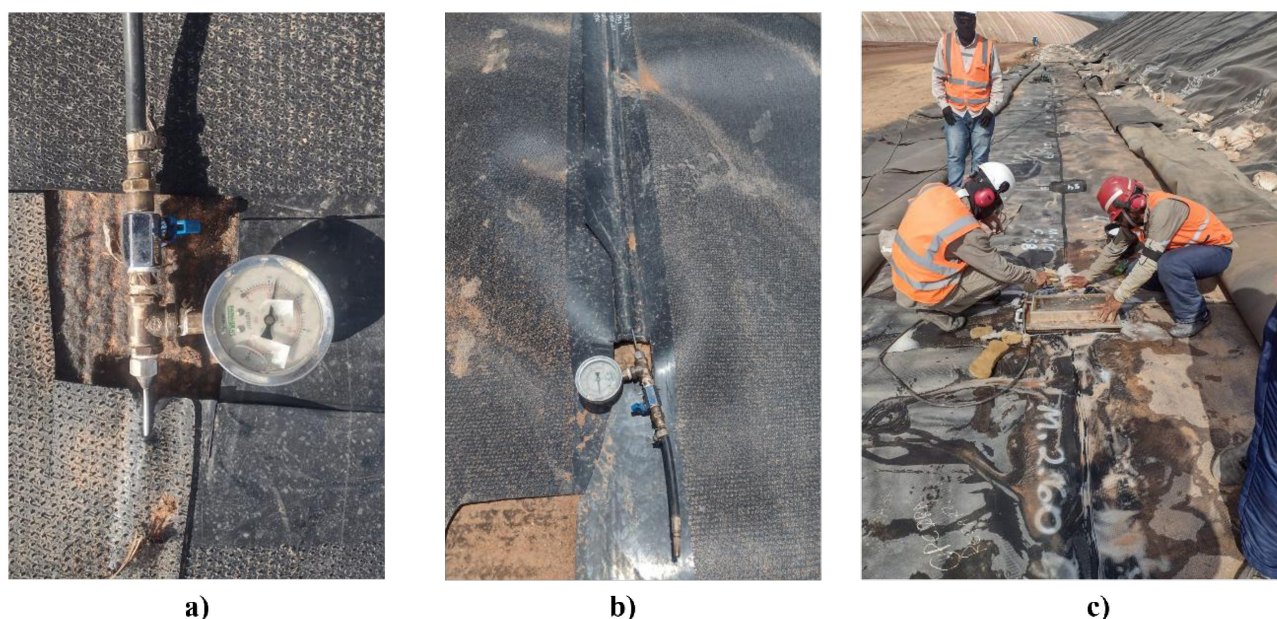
CQC testing on flat-die textured HDPE geomembrane: (a) air pressure testing on hot wedge weld with textured-to-textured overlap; (b) air pressure testing on hot wedge weld with smooth-to-smooth edge overlap; (c) vacuum box testing on extrusion weld.
